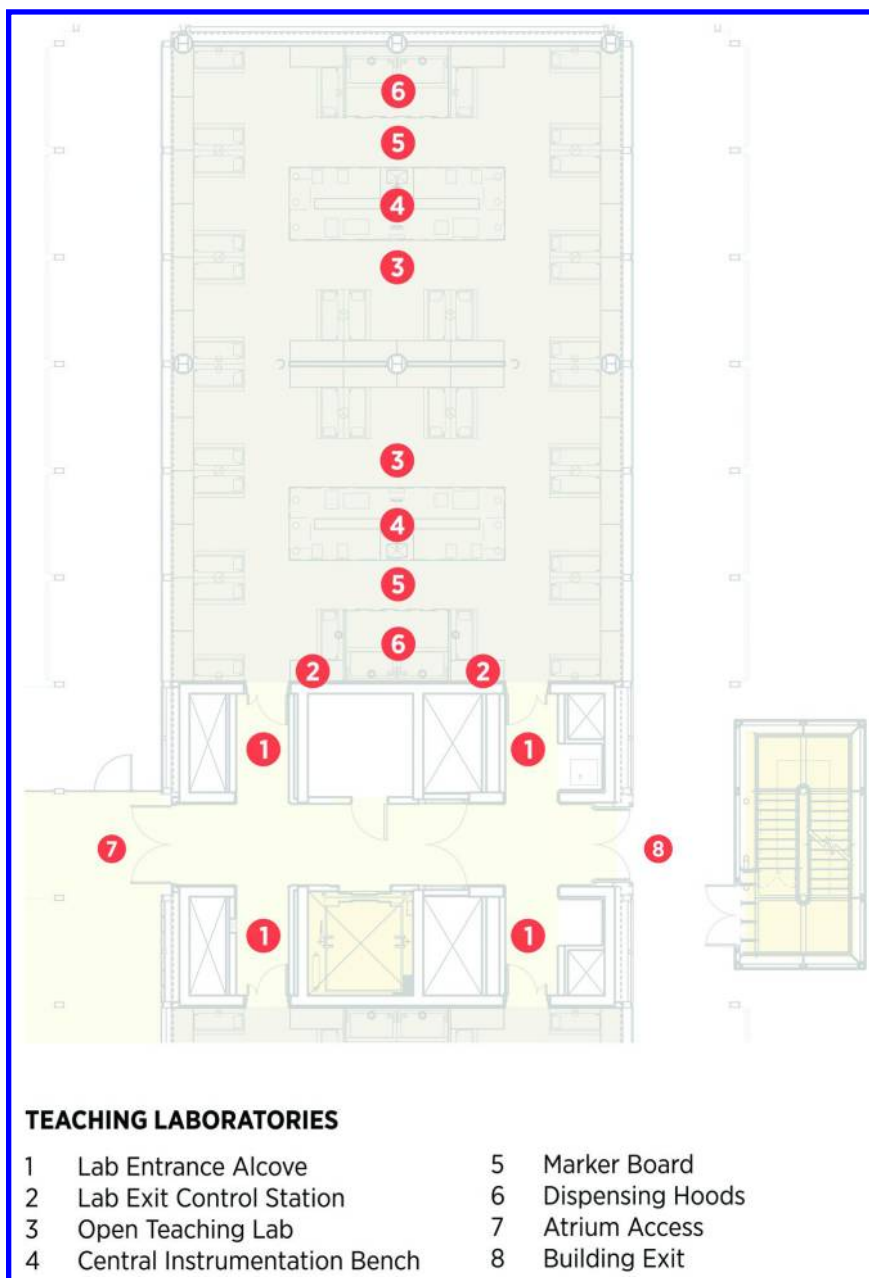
Princeton University, Frick Chemistry Laboratory: Perimeter fume hood alcoves are located around a shared centralized equipment bench. Payette, Architect, in collaboration with Hopkins Architects, Design Architect Image Credit: © Payette. (see color insert)
